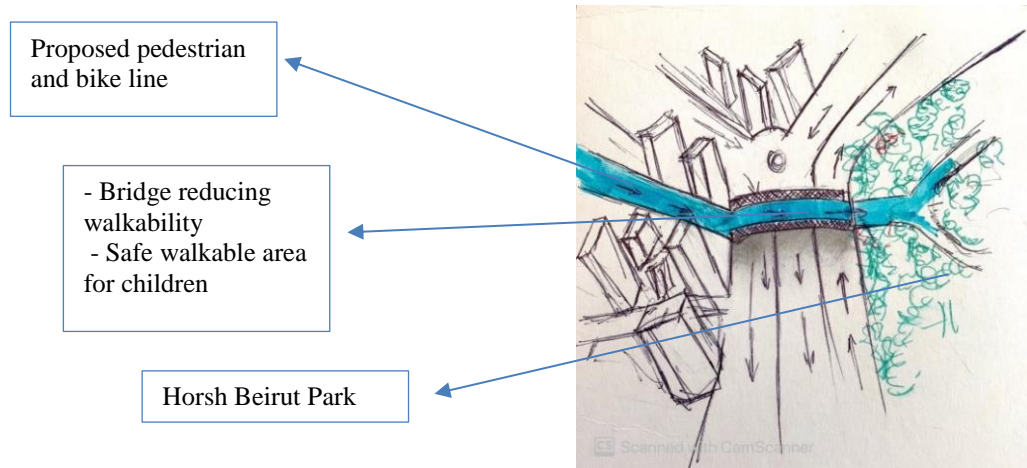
Proposal Bridge linking a small road of Sabra to Horsh Beirut park
